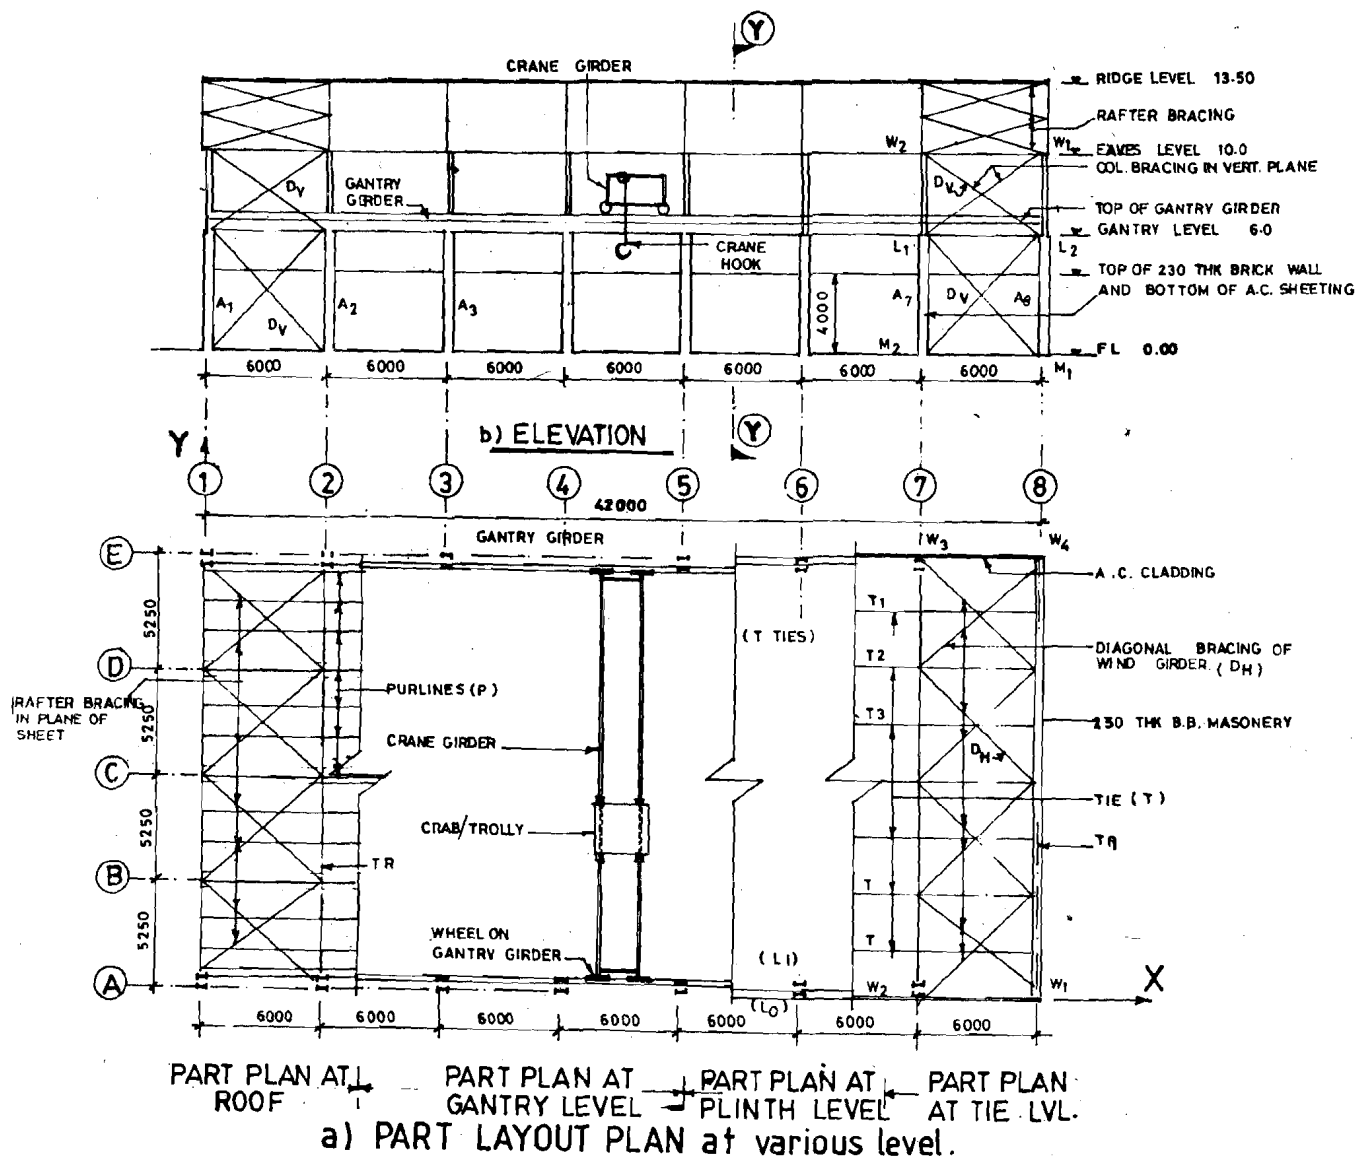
(a, b) : Part Layout Plan and Elevation at Various Levels
